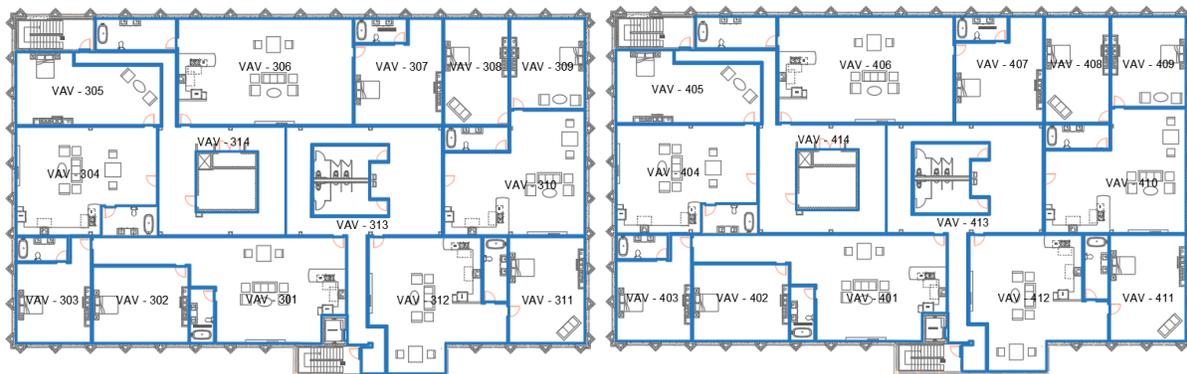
Zoning - Floor 3 (left) - Floor 4 (right)
